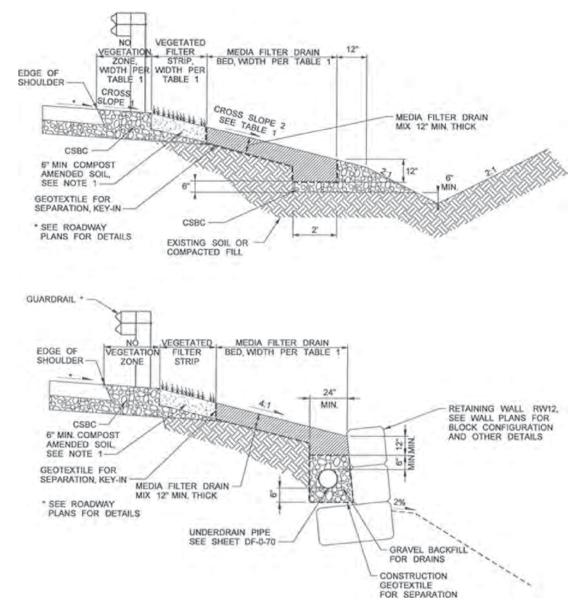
WSDOT media filter drain without underdrains (top) and with underdrain and retaining walls in space-limited sections (bottom).
